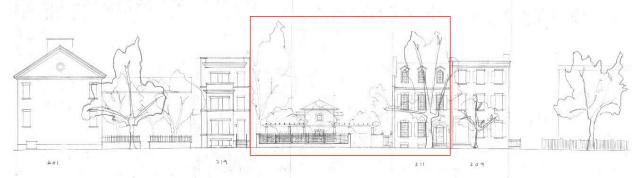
Block elevation with proposed modifications to 211 S St Asaph in the highlighted area
